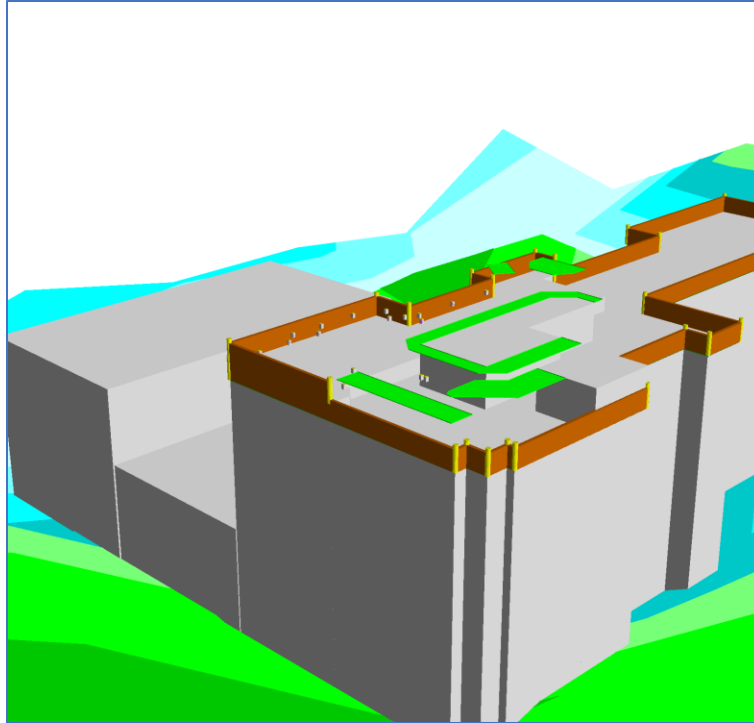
AC HOTEL GASLAMP ROOFTOP RESTAURANT 3-D RENDERING
